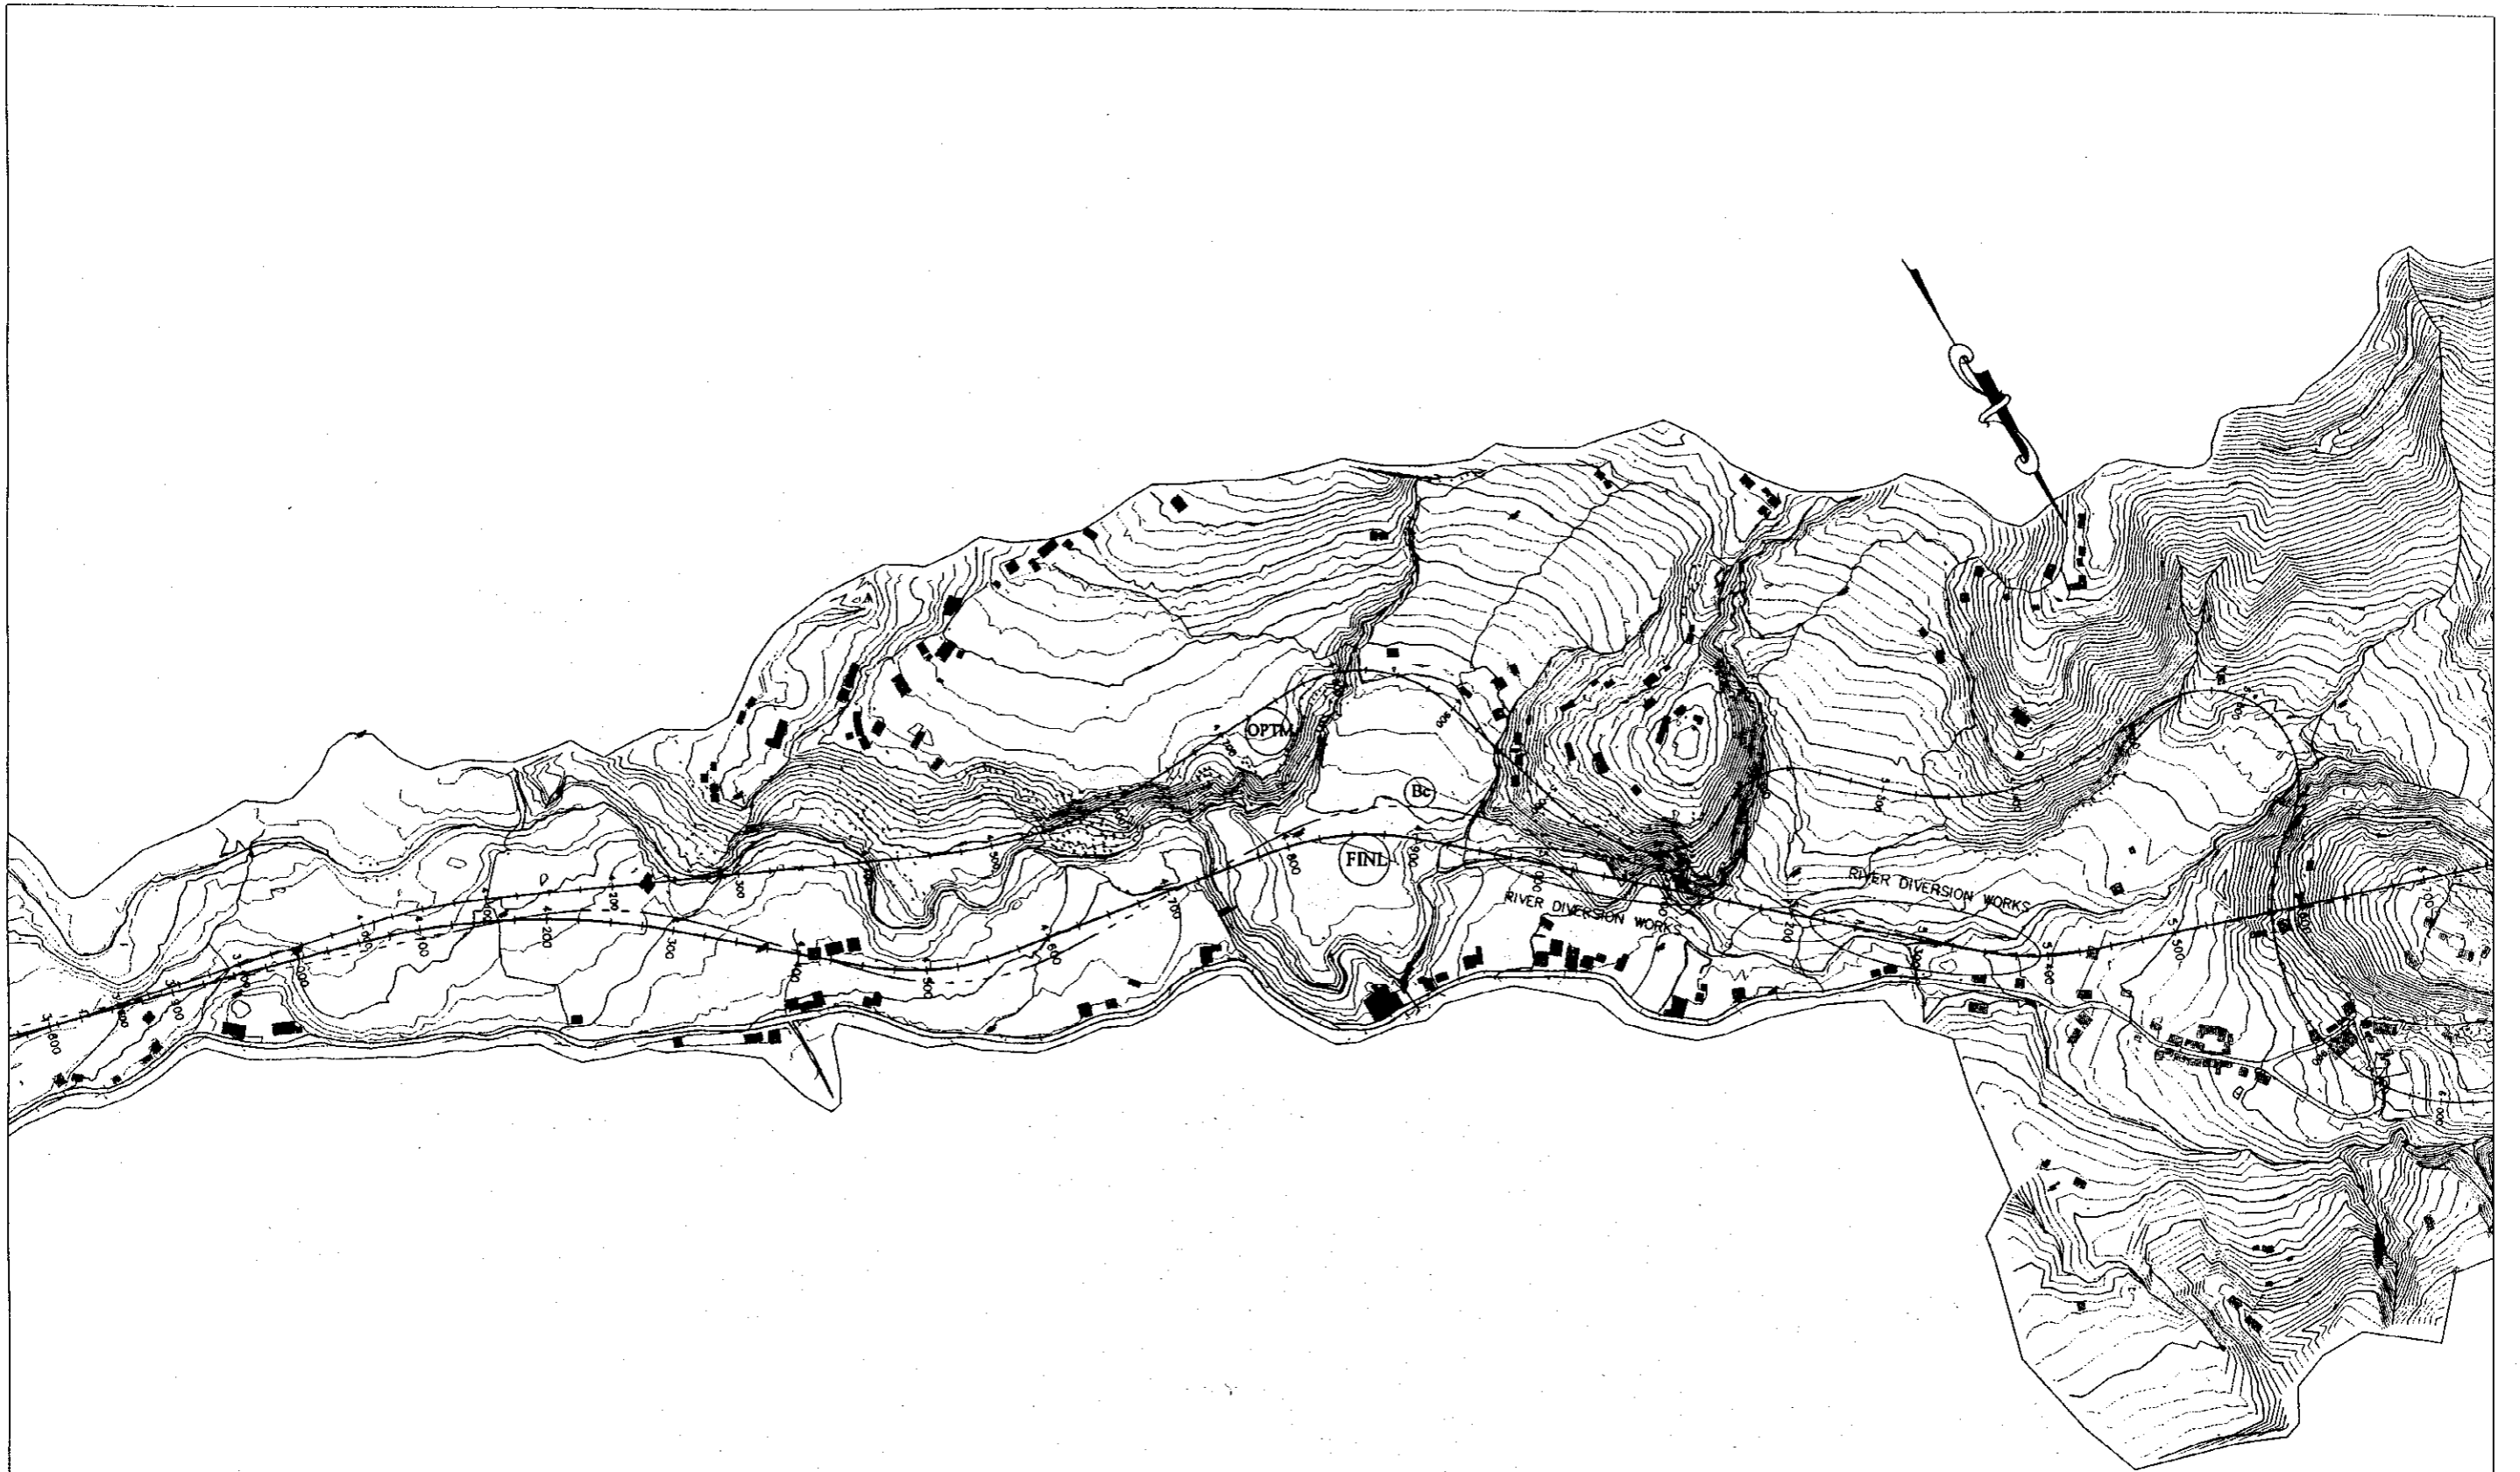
Section from STA.3+800 to Kathmandu Side Tunnel Portal
